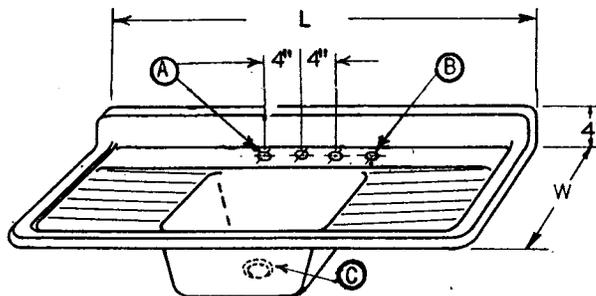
LAVATORY SUPPLY OPENINGS, AND OUTLET DETAILS.
